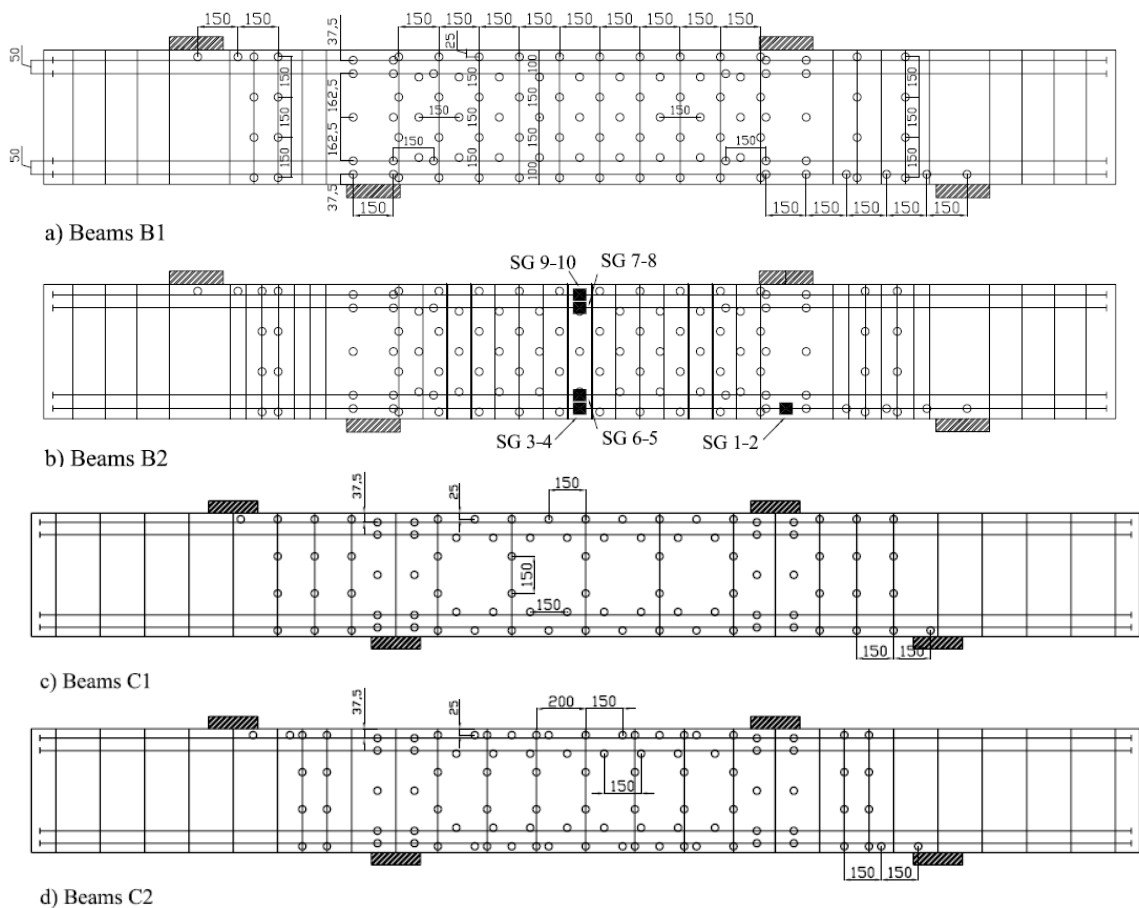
Demec grids- a) Beams B1; b) Beams B2 (strain gauges); c) Beams C1; d) Beams C2
